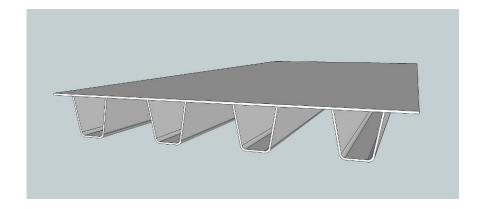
Orthotropic Bridge Deck
